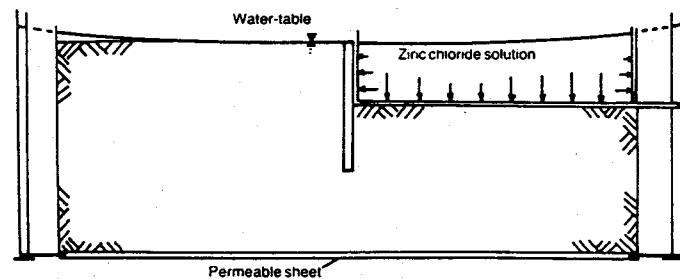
Arrangement of Cambridge tests on model diaphragm walls
